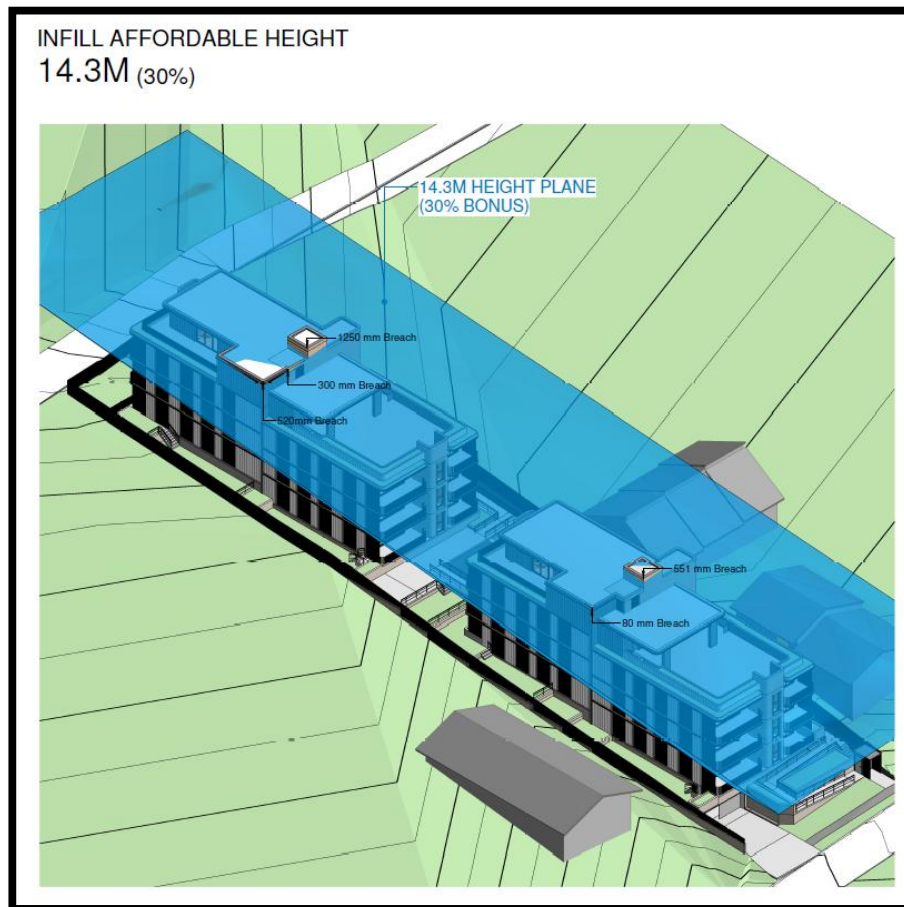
Building height blanket diagram showing areas of encroachment above 14.3m building height limit
